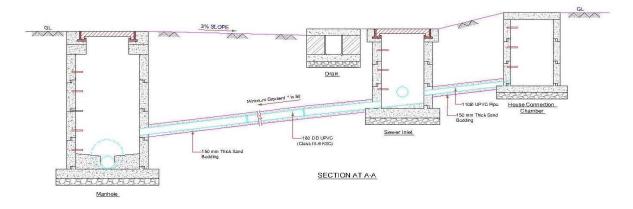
Arrangement of Proposed Sewer Line and House Connection Chambers
